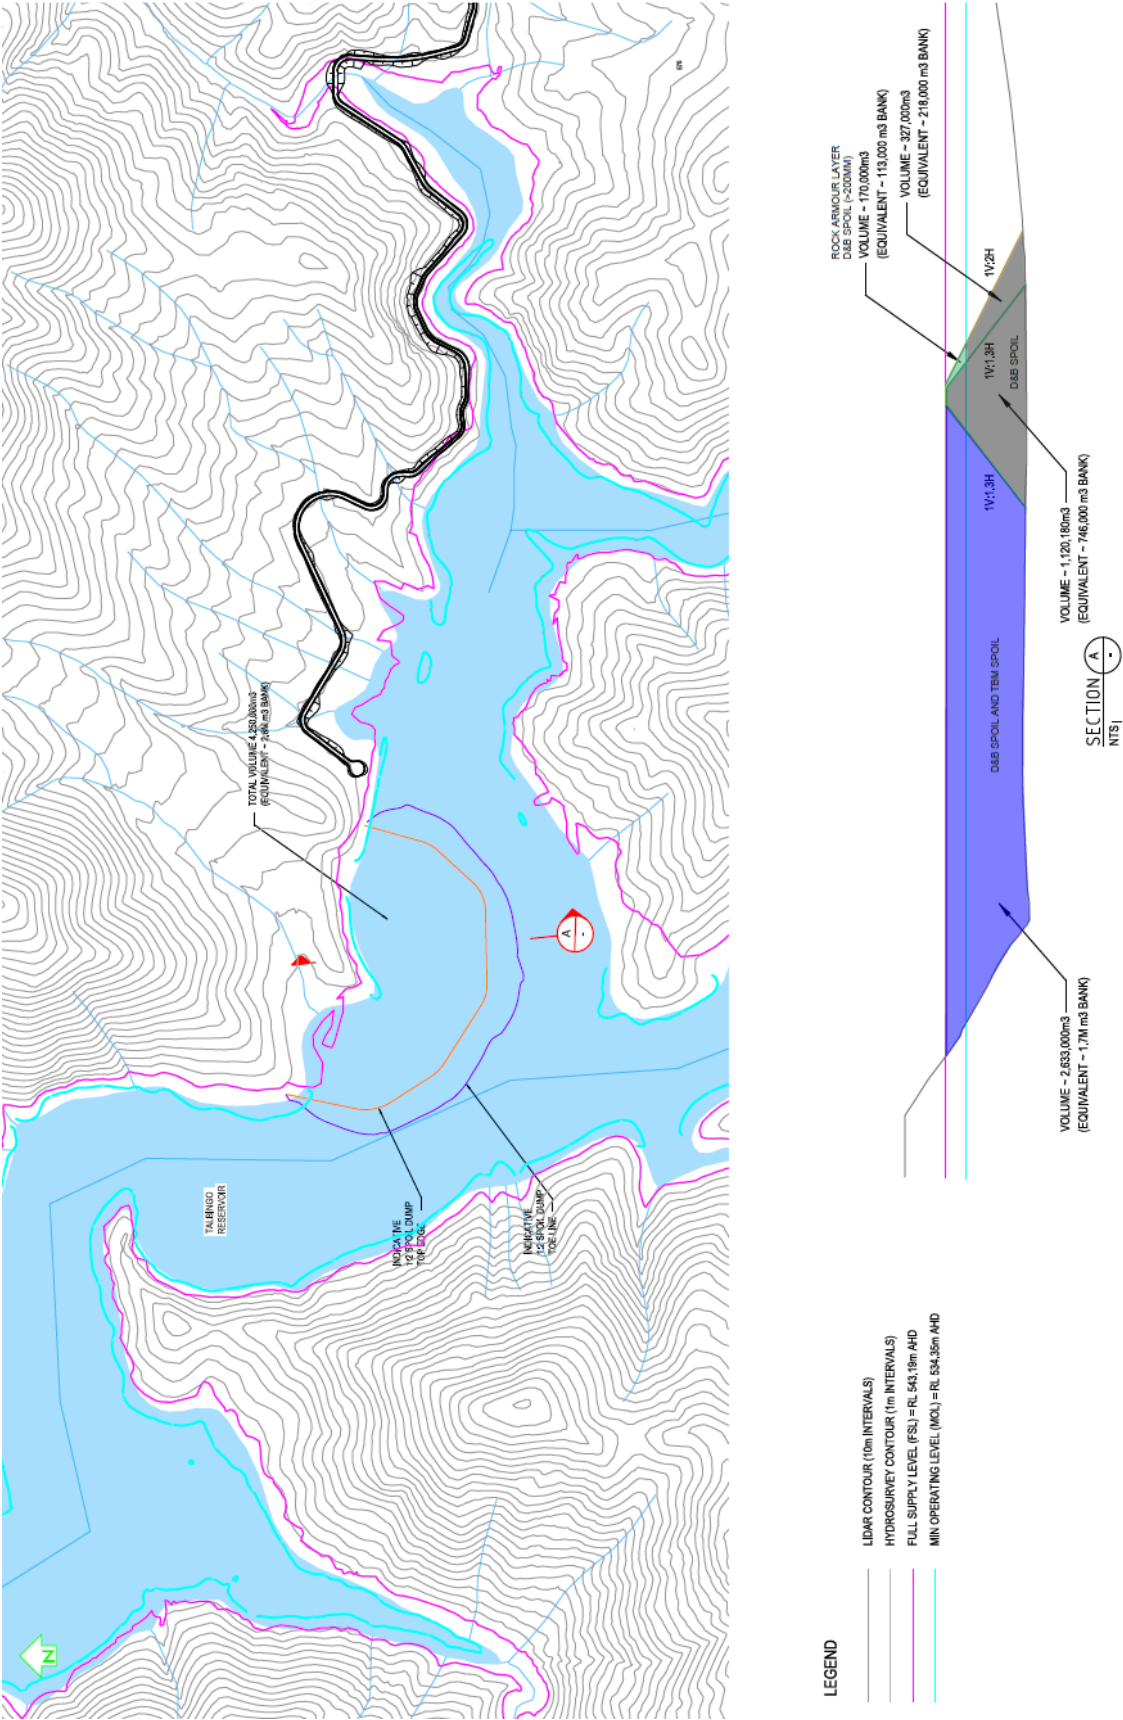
Talbingo – Finished excavated rock footprint and section
